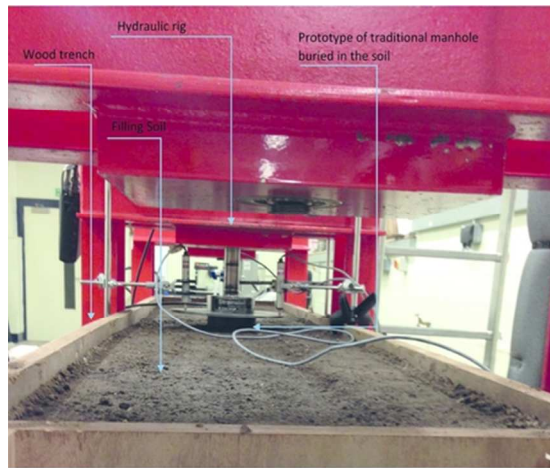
a. Setup of the trench in the rig and location of measurement instruments on the traditional manhole surface at three points on the edge.
